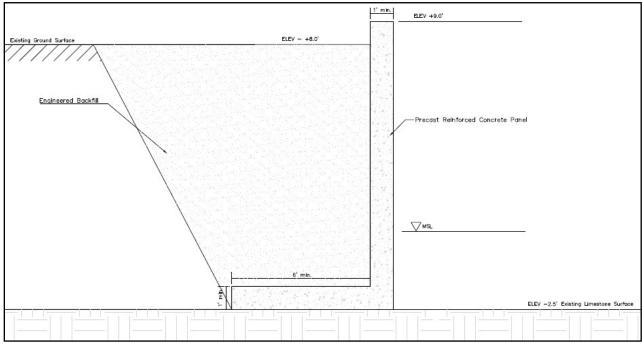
Typical Detail of a Precast Concrete Panel Wall
